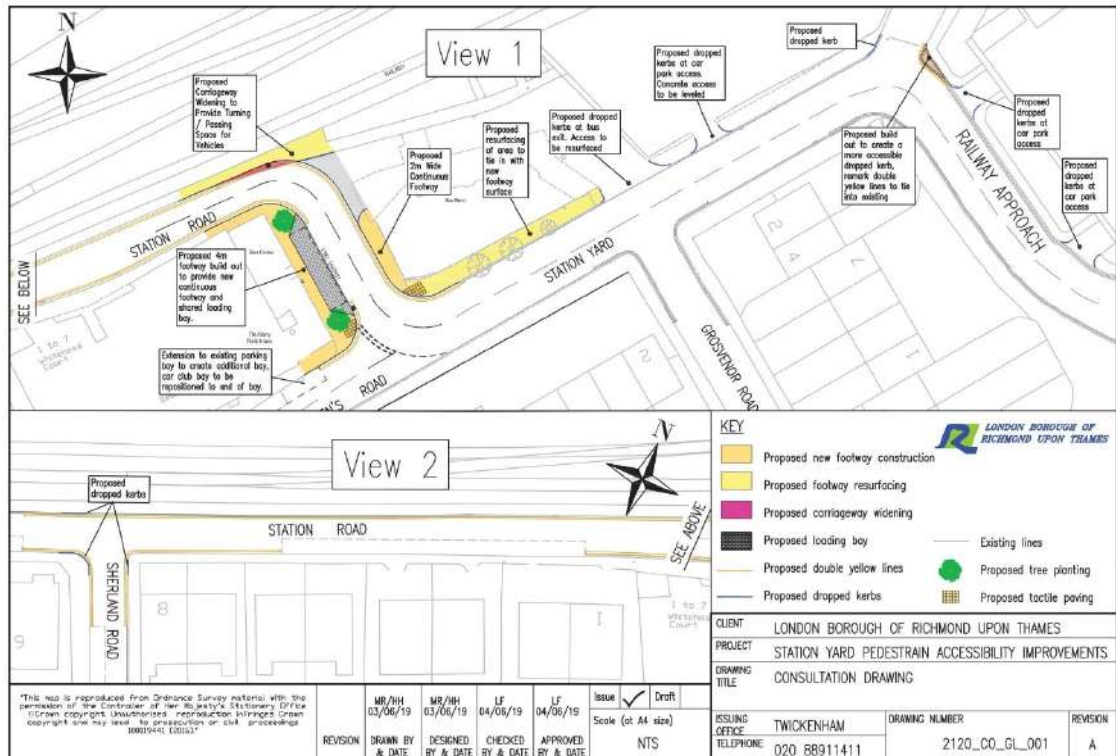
Proposed Improvements to Station Yard (LBRuT)
